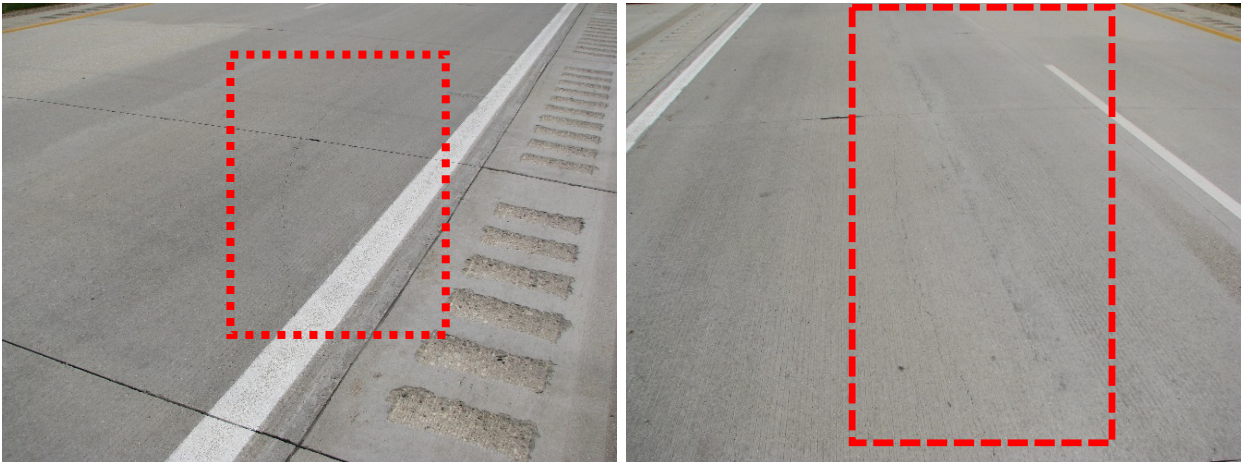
Longitudinal cracks on US-10 near Coleman, MI
